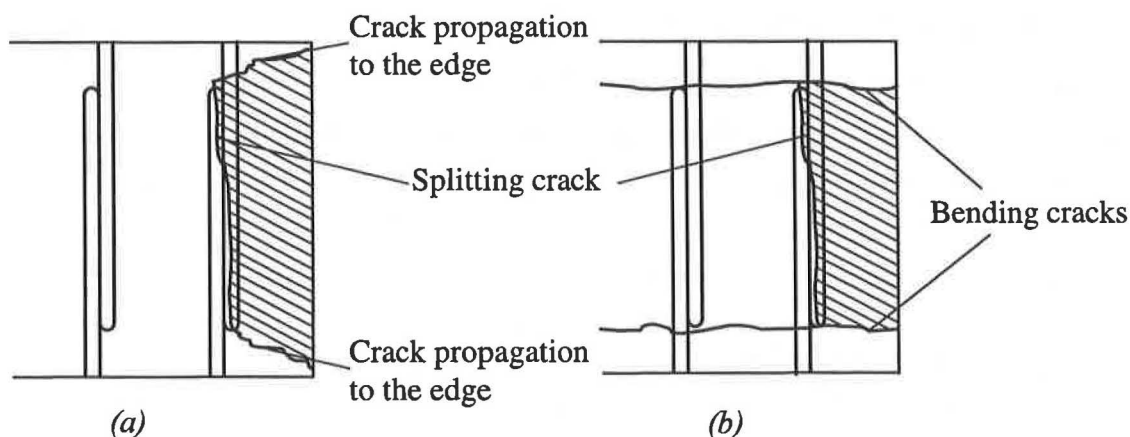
Possible crack patterns, which cause spalling of the concrete cover.
